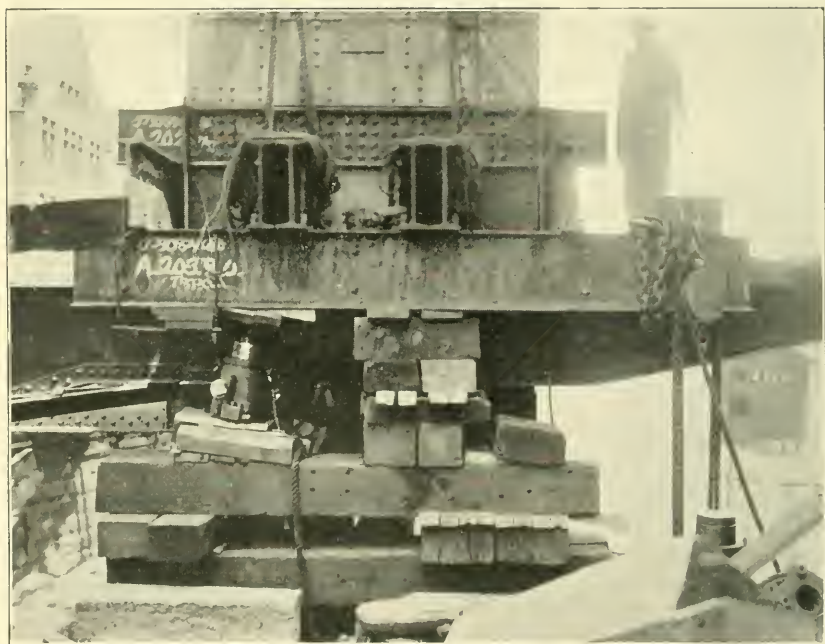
JACKING TRUSSES INTO POSITION Laterally AFTER RAISING BRIDGE.
